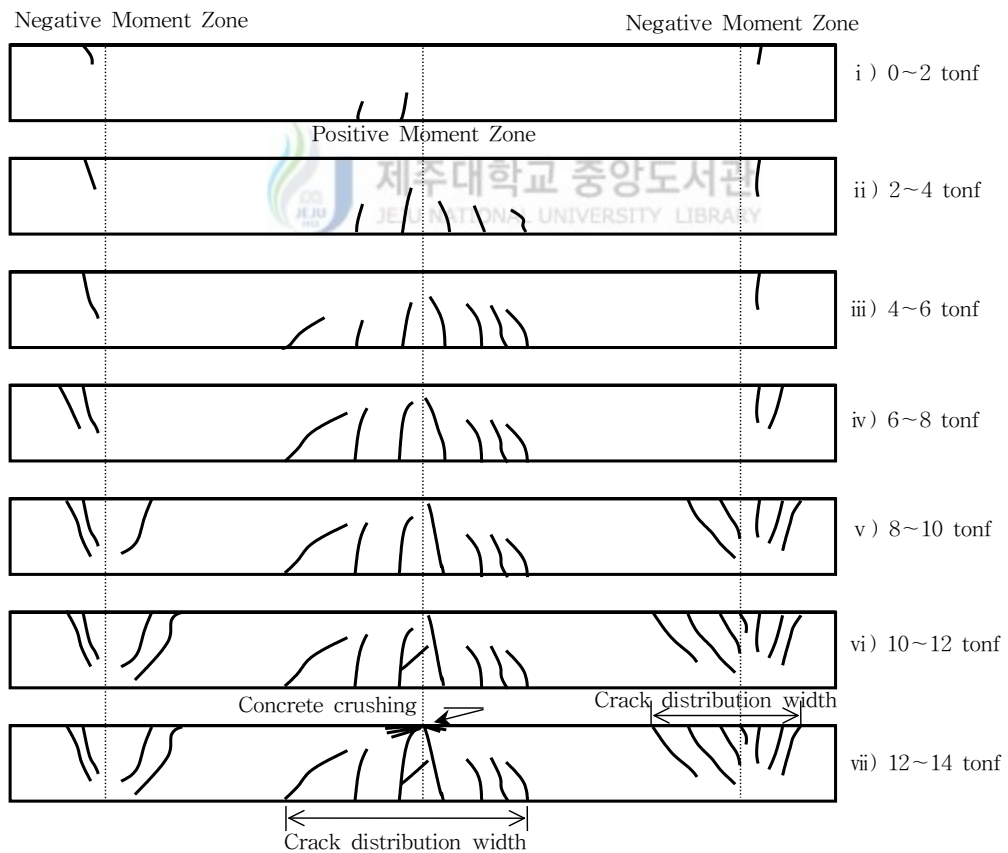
Crack propagation with different load levels in Steel concrete slab
